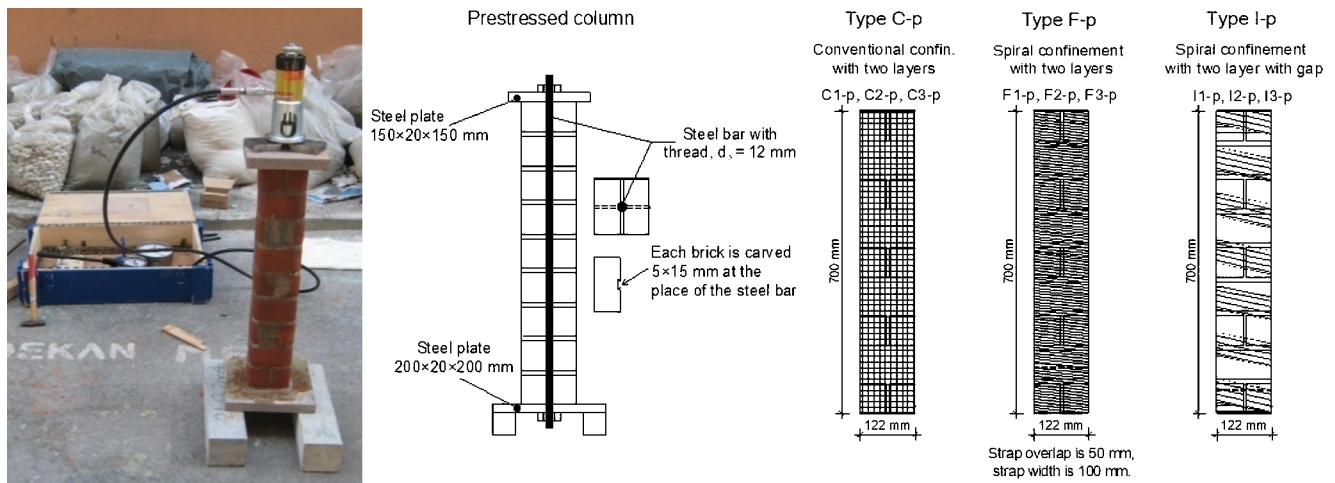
Specimens which were exposed to compressive load (prestressing) during confinement
